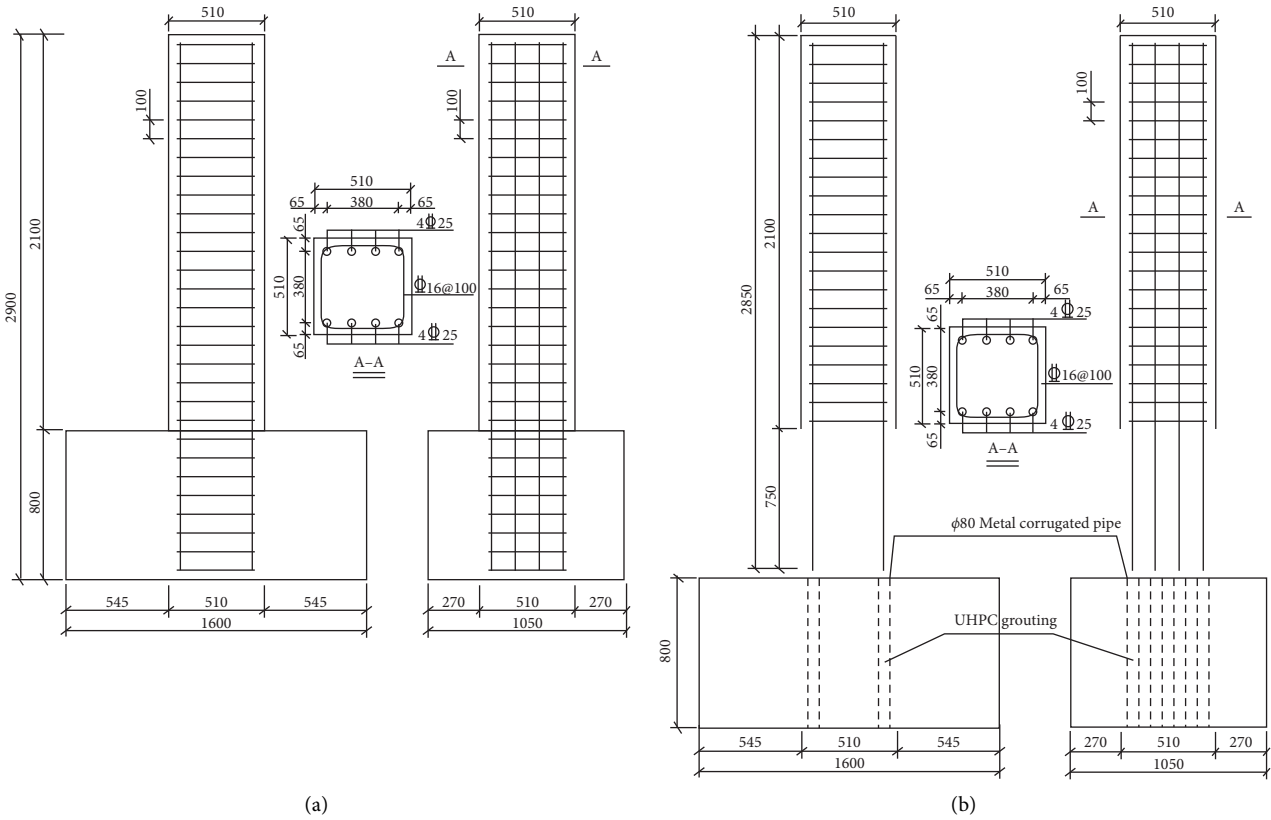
Schematic diagram of specimen reinforcement. (a) Specimen A and (b) specimen B1/B2.
